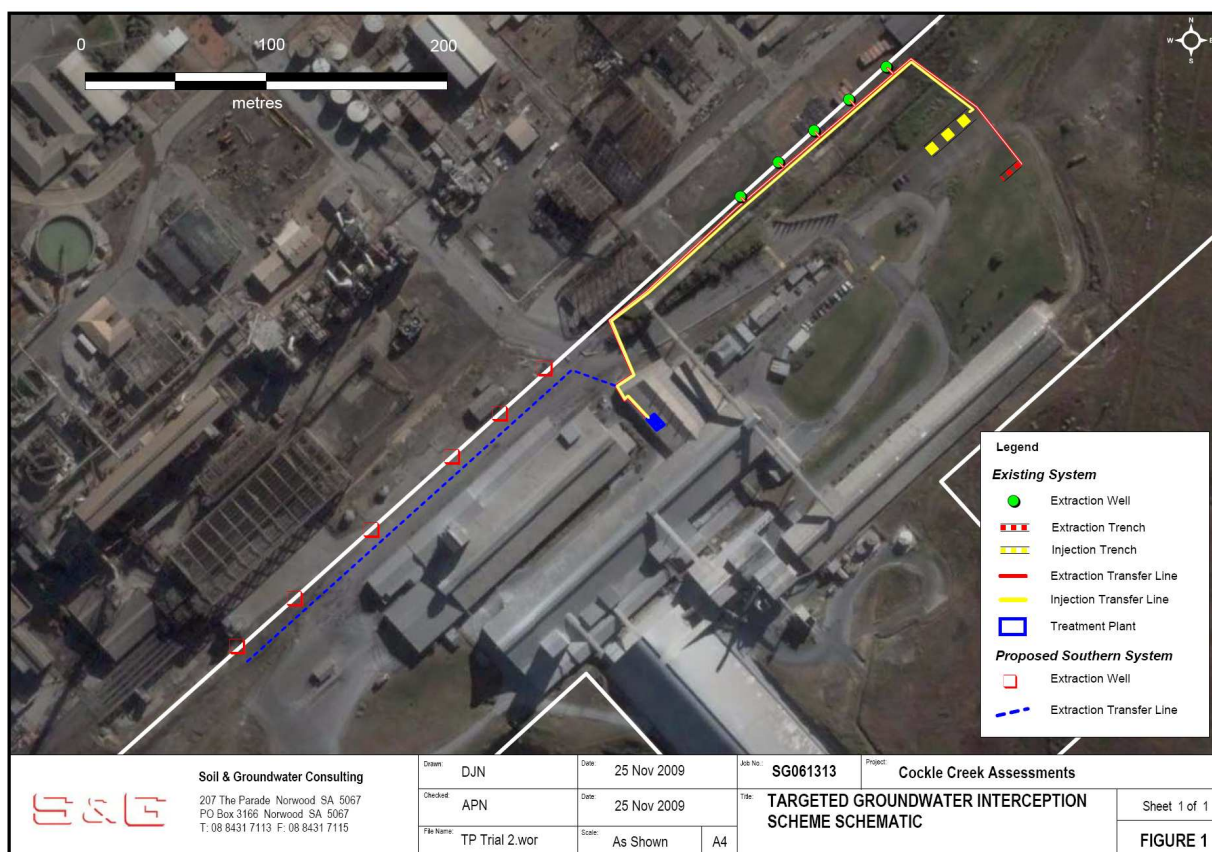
Site Plan Illustrating the Location of the Proposed Components
